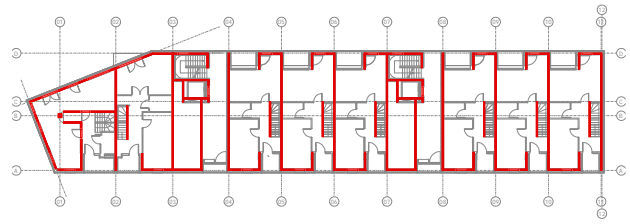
Ground and First Floor Layouts © EURBAN Ltd.
